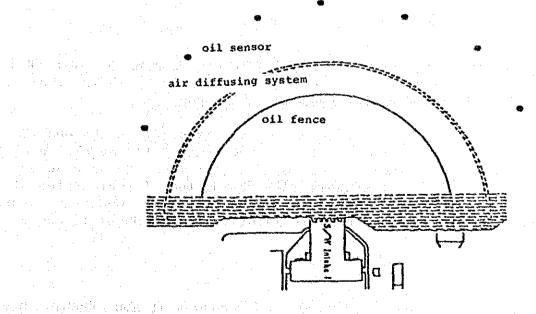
Existing Oil Spill Protection Facilities
